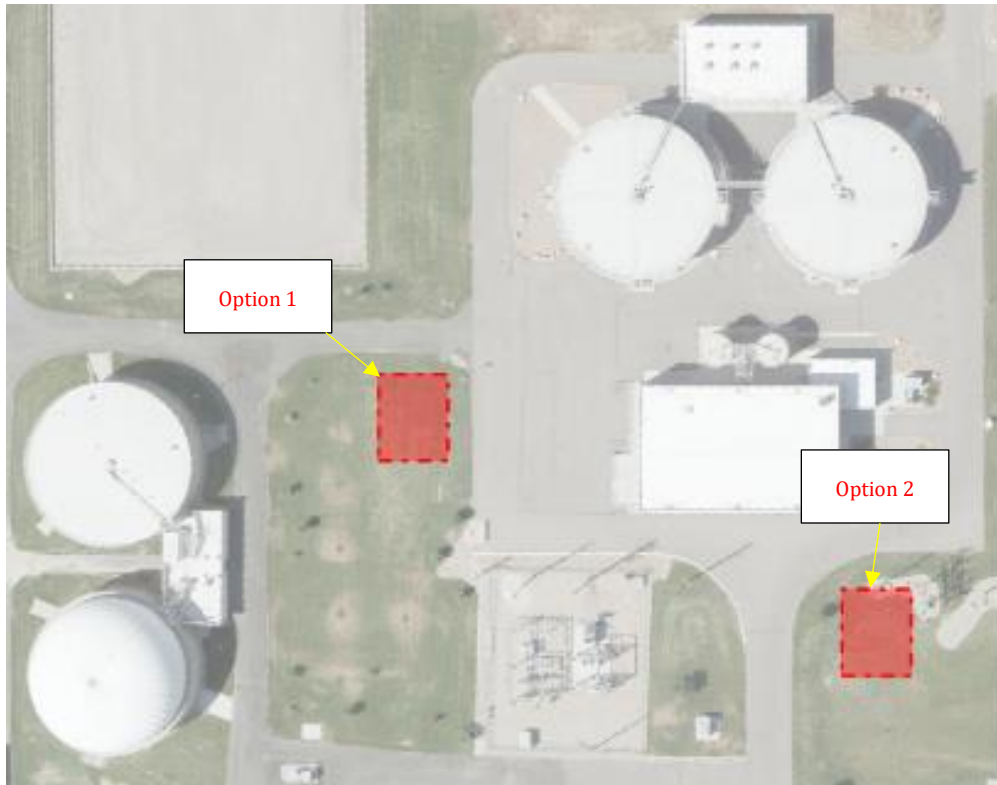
Sidestream Phosphorus Facility Site Layout Options
